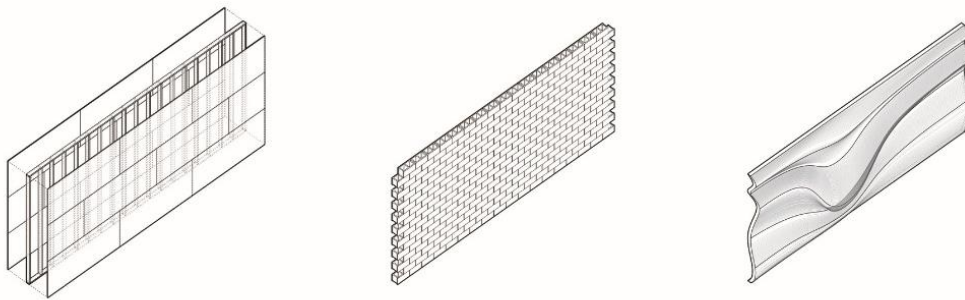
(a) Wood Stud Wall 840 lbs; (b) CMU Wall 5,800 lbs; (c) Composite Wall 230 lbs.
